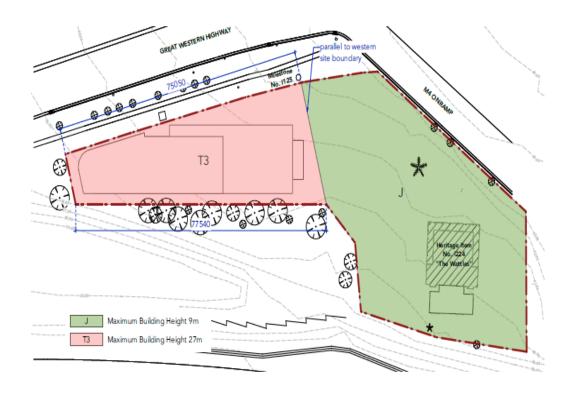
Maximum building heights as applied to concept plan for Scheme 4
